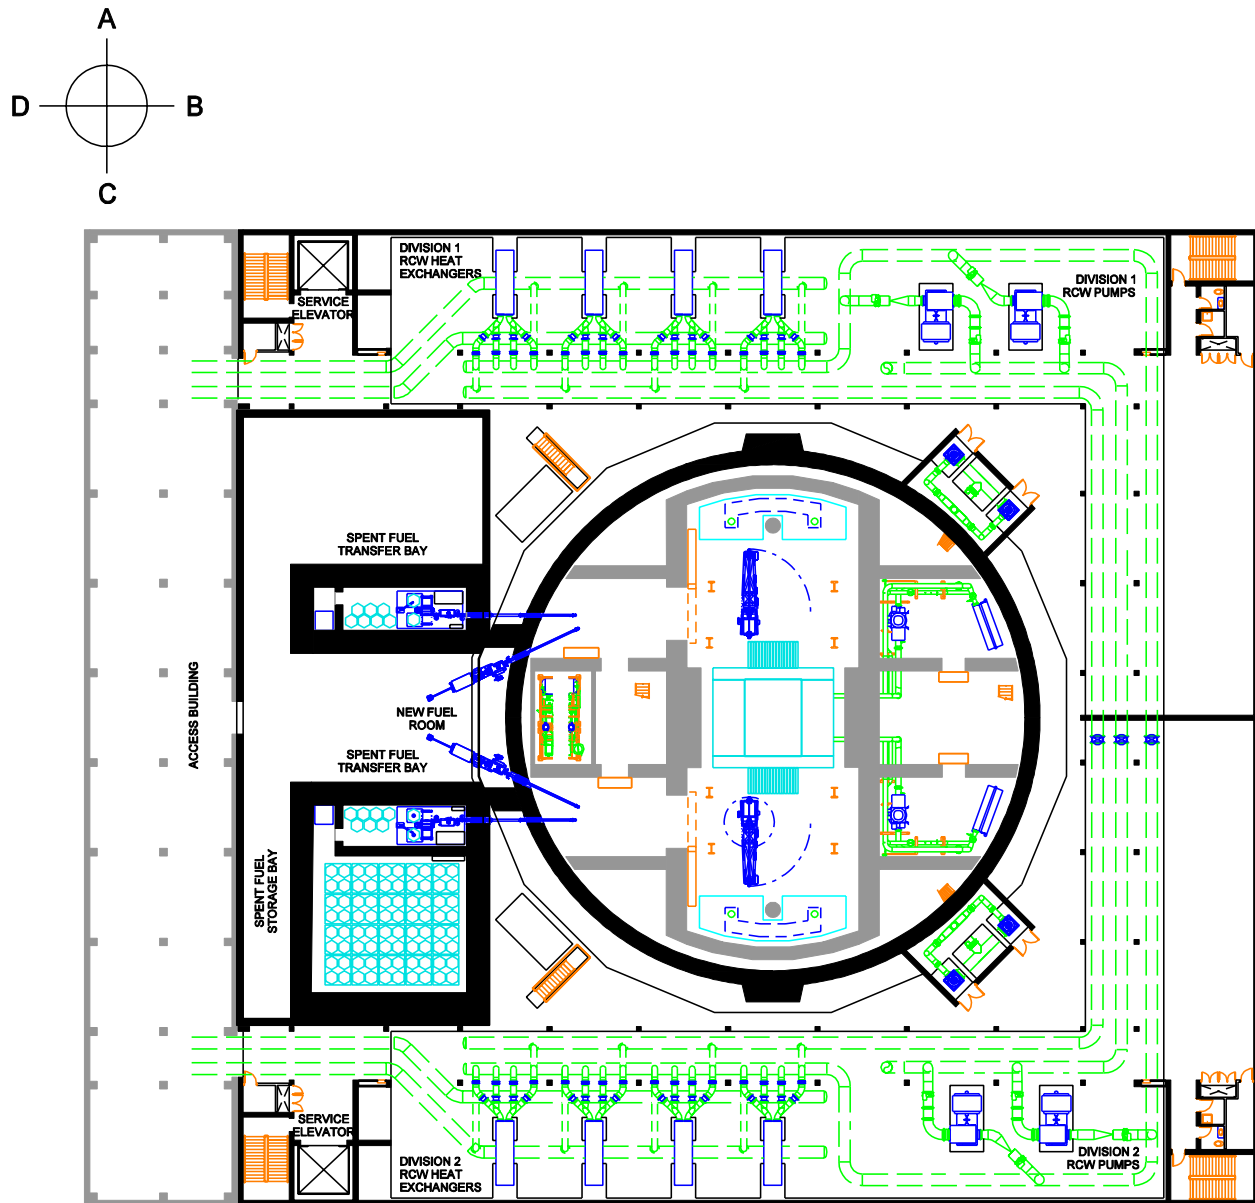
ACR-700 Reactor Auxiliary Building – Plan at Elevation 99.0 m
